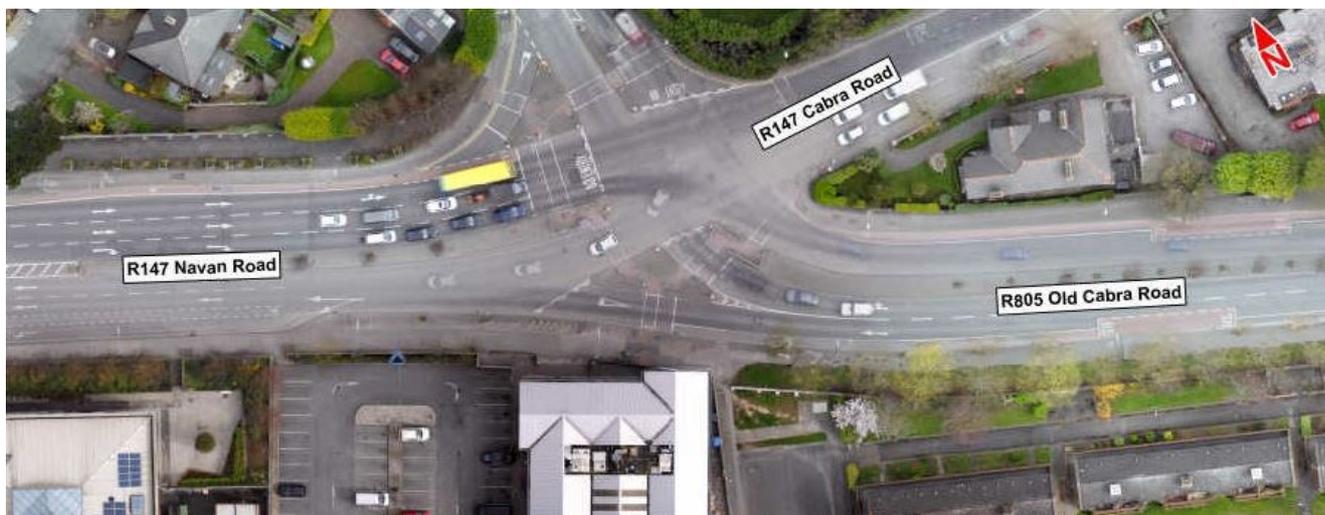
R147 Navan Road / R805 Old Cabra Road Signalled Junction
